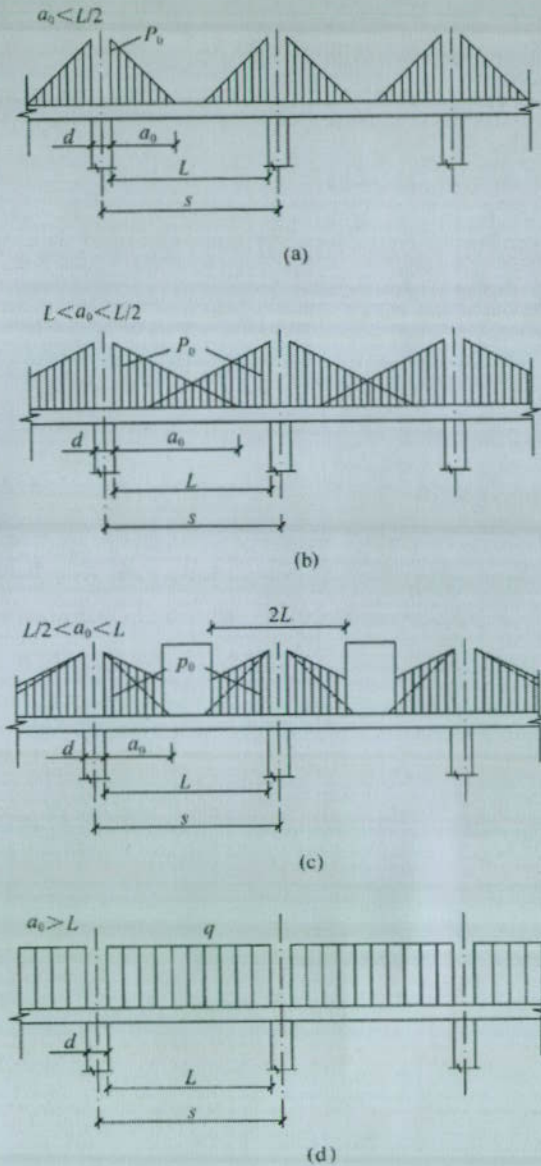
Calculation diagram for continuous cushion cap beam of strip pile foundation under the brick wall
